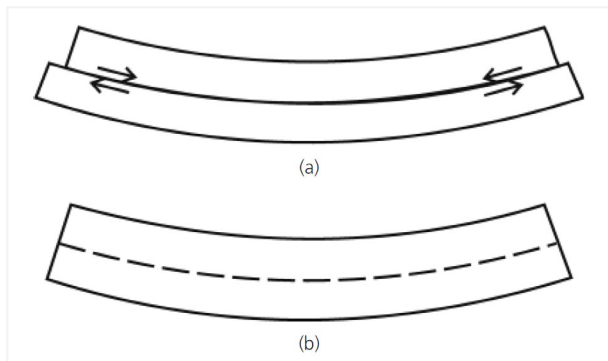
Schematic illustration of interlock slippage phenomenon: a) zero shear stress transfer in the interlock; b) full shear stress transfer, e.g. in the case of welded interlocks (reproduced from Bourne-Webb et al., 2010)
